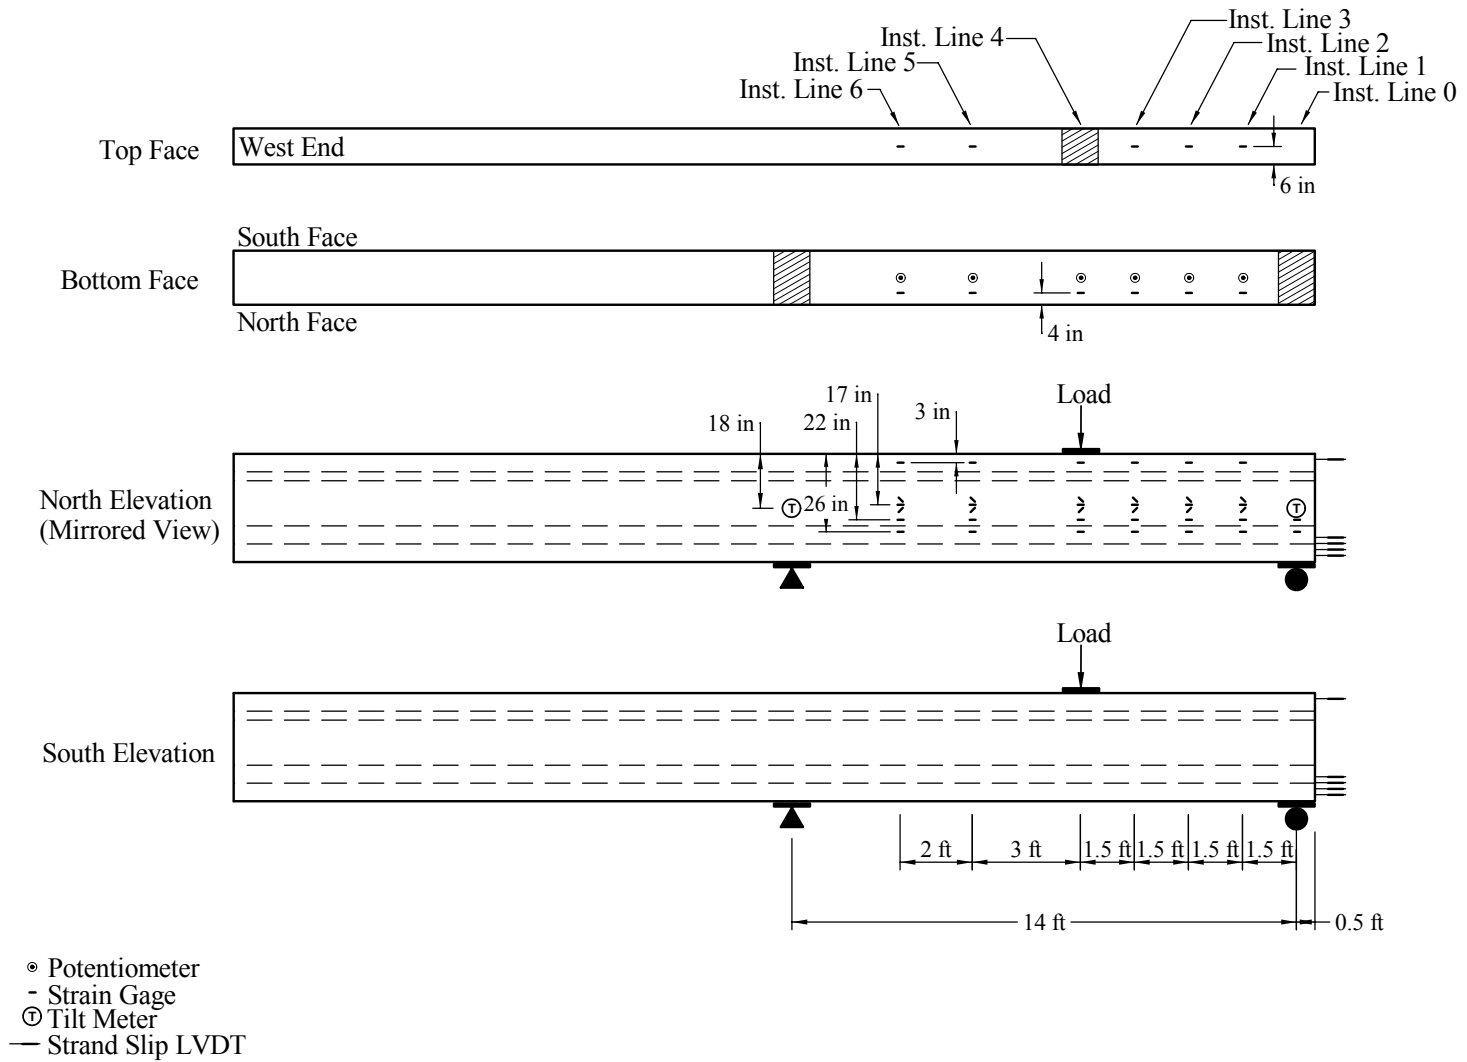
A: Instrumentation plan for Girder 14S
